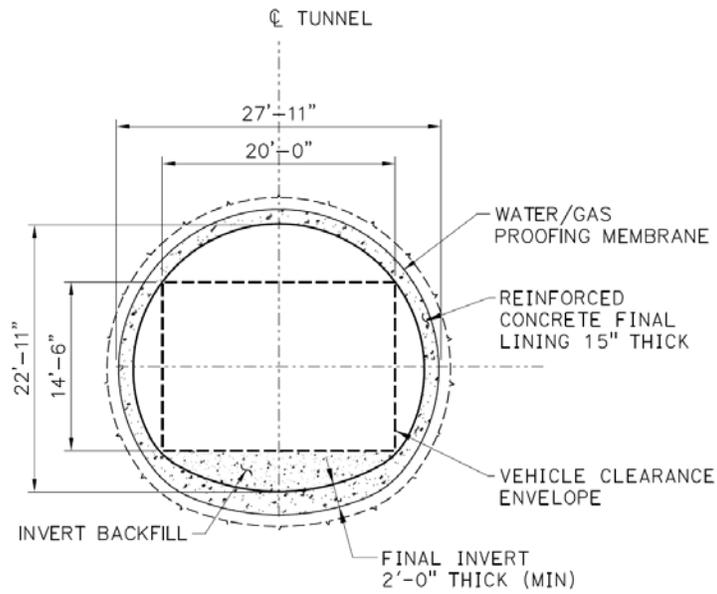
Cross Section of Cross Passage for Freeway Twin-Bore Tunnel
